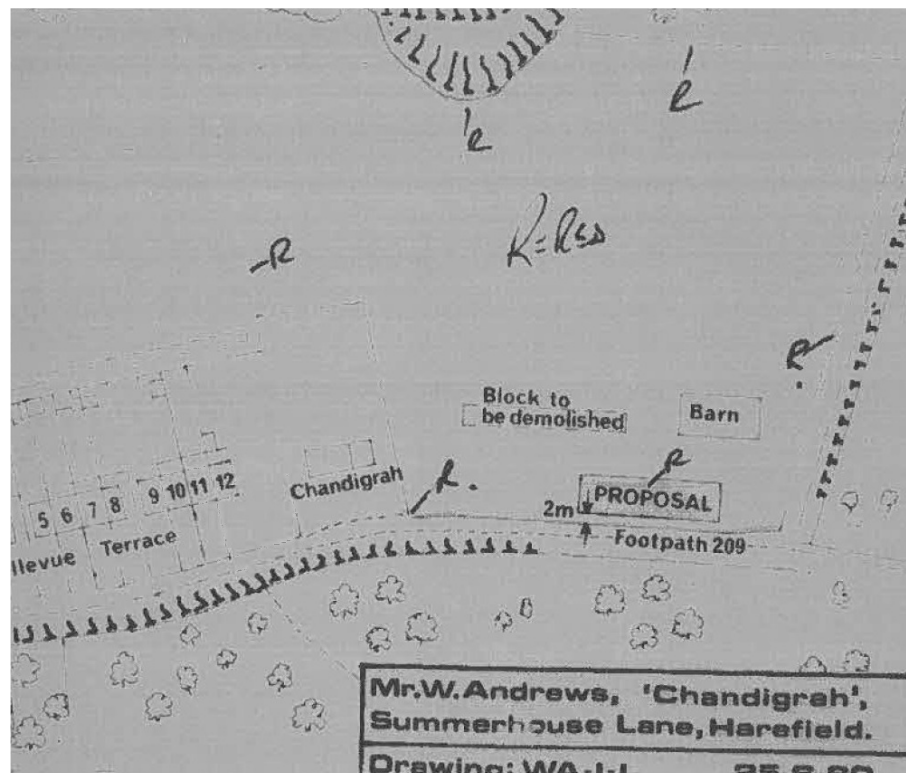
Extract from proposed site plan – drawing no: WA-1-1, dated 25/6/1980
